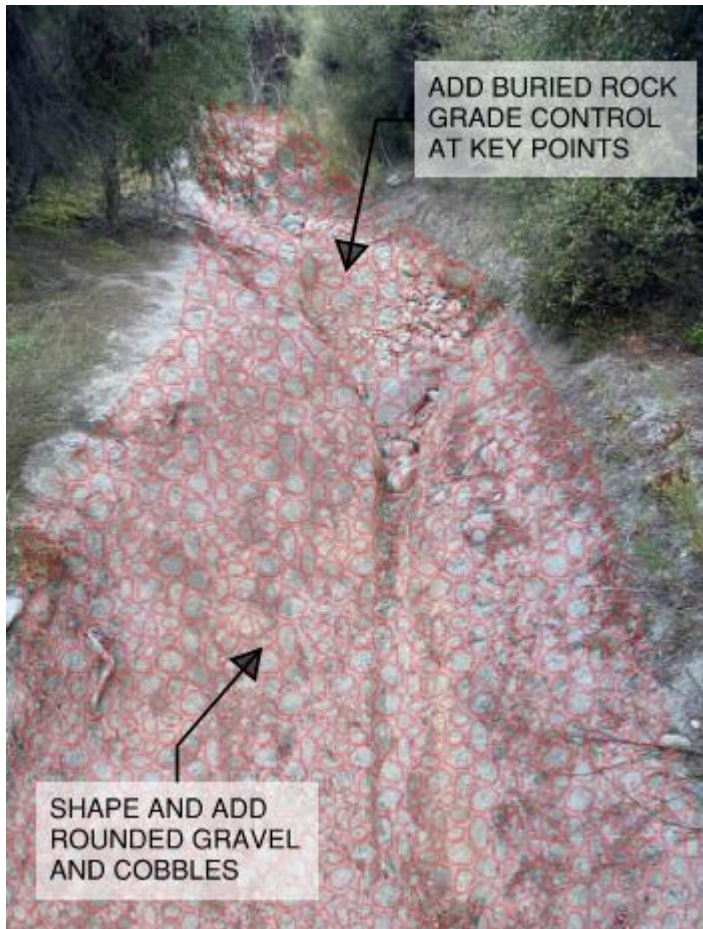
Sketch of works to section of mountain bike track where flow runs down the track.
